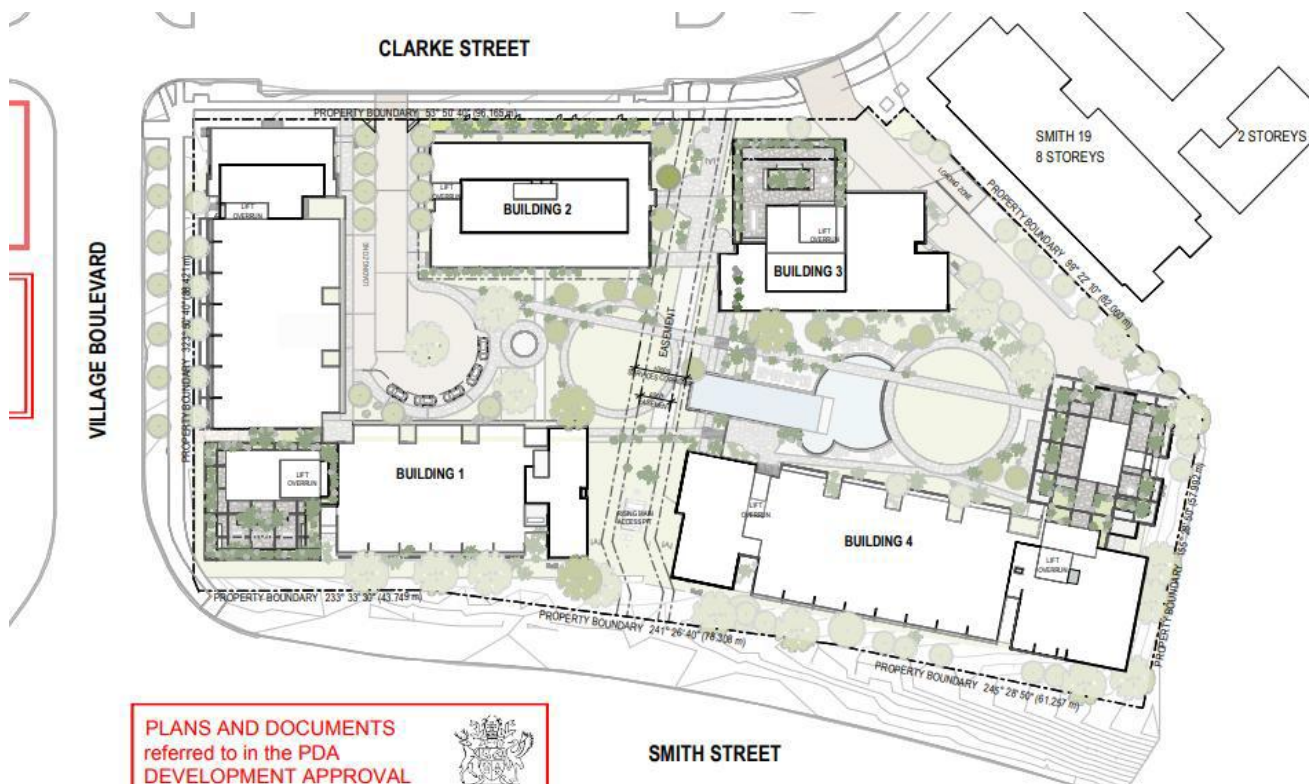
Approved Site Plan (DEV2024/1528)
